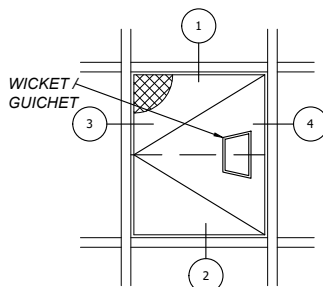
DETAILS SHOWING PROJECT OUT PHANTOM VENT WINDOW INSTALLED INTO THERMAWALL 2600
